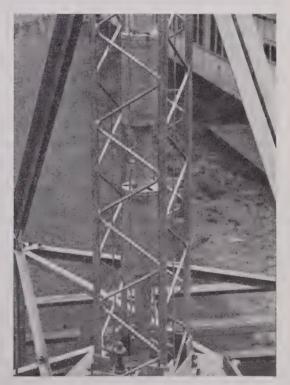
Two-slug coaxial-line tuner located in the base section of a lattice-tower structure.
